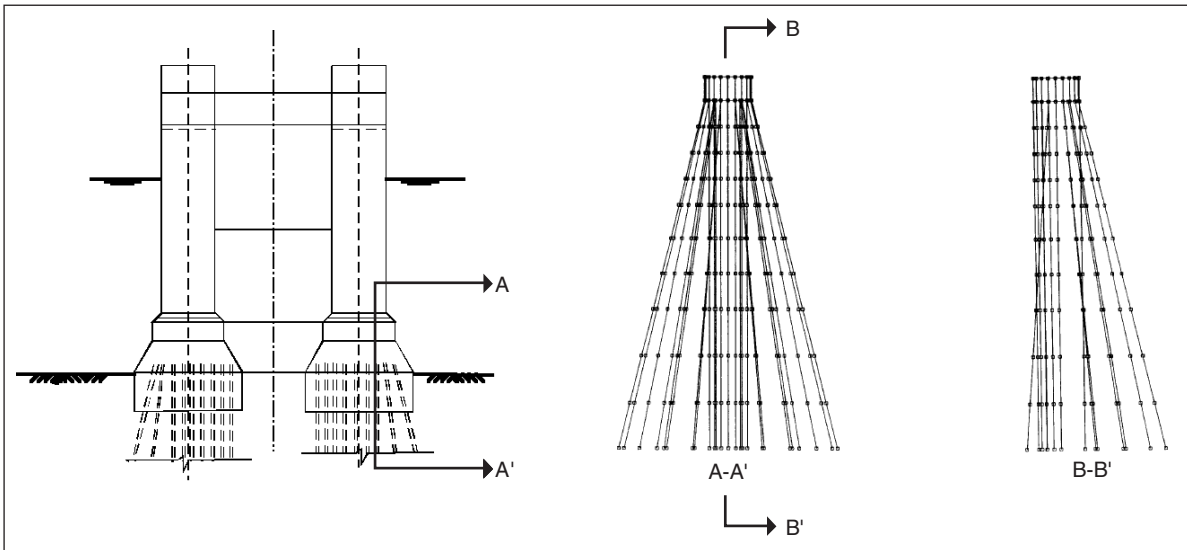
Slender pile group foundation and a portion of the beam-element half-model.
